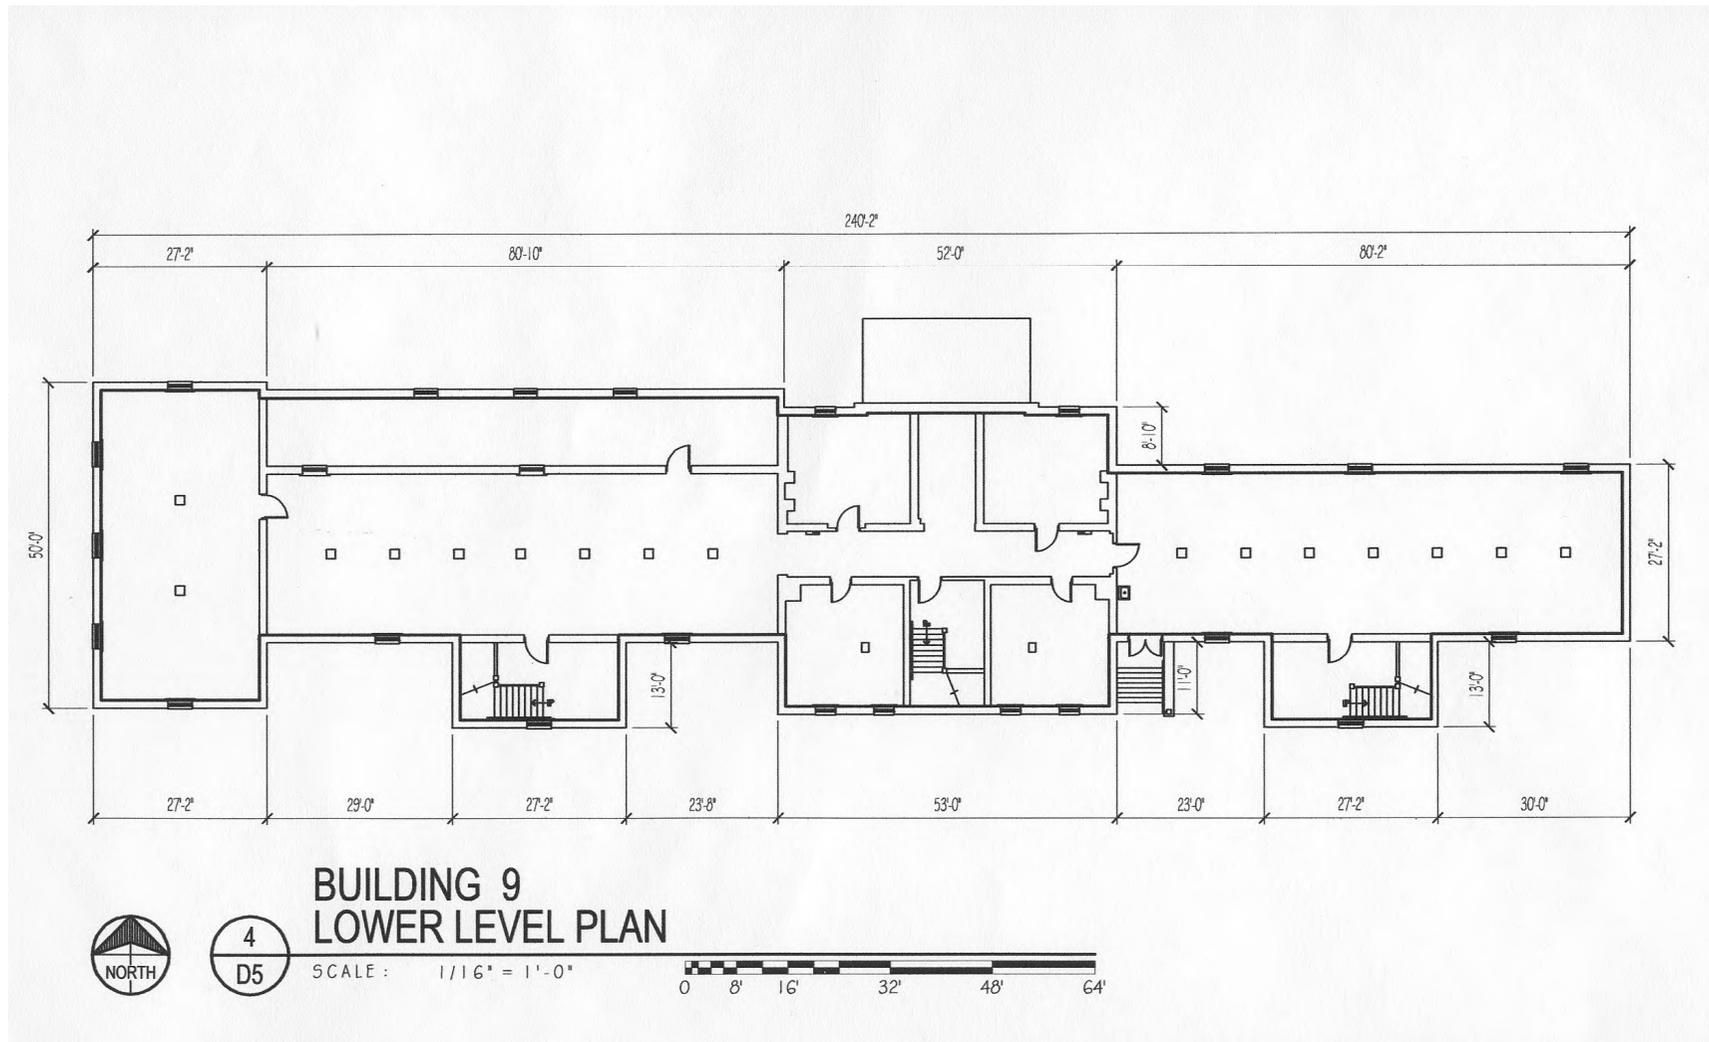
Basement plan of Building 9, showing existing conditions (Walton and Associates 2003).
